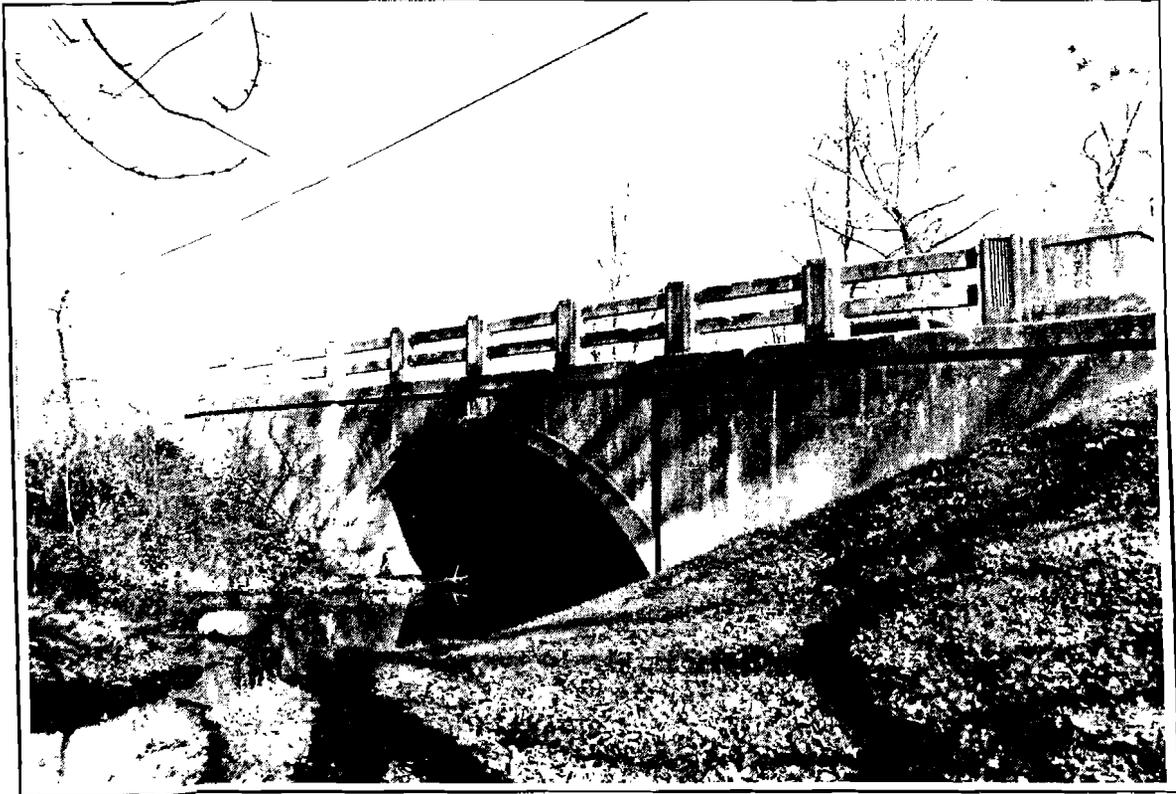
Bridge #27 B (K-6466), West Elevation, Northeast View
